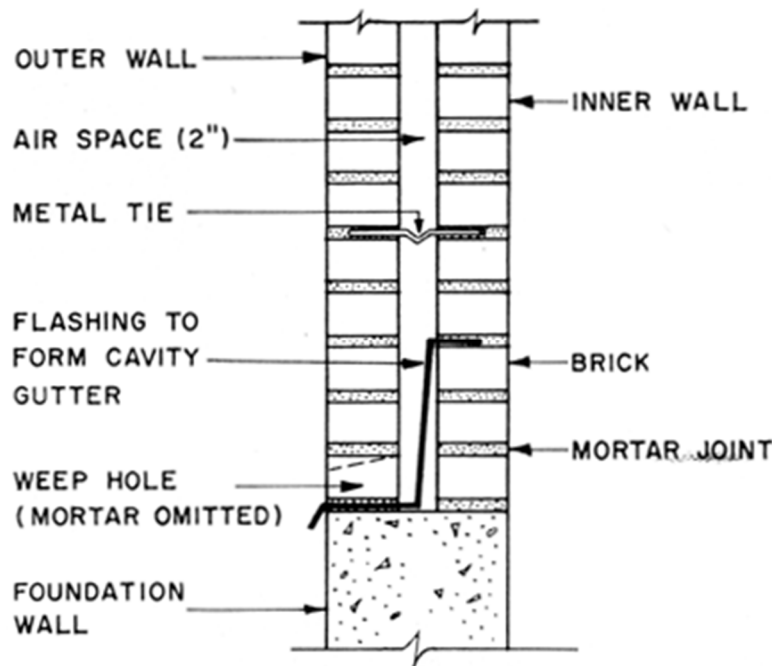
Typical Flashing Installation at Bearing Support of Cavity Wall.
